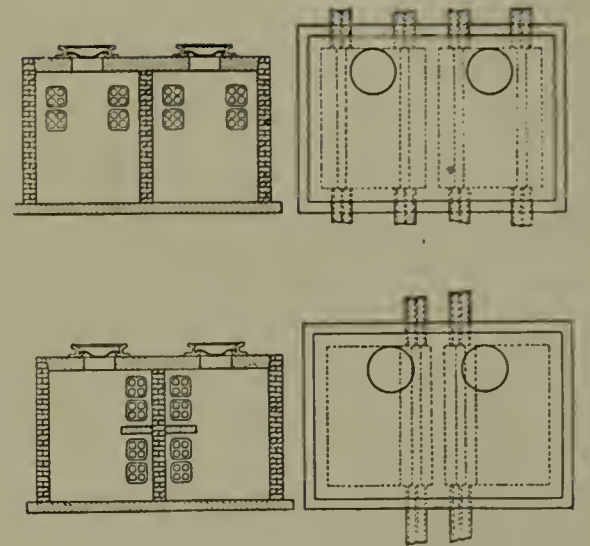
SHOWING GENERAL CONSTRUCTION OF MANHOLES AND THE GROUPING OF DUCTS
